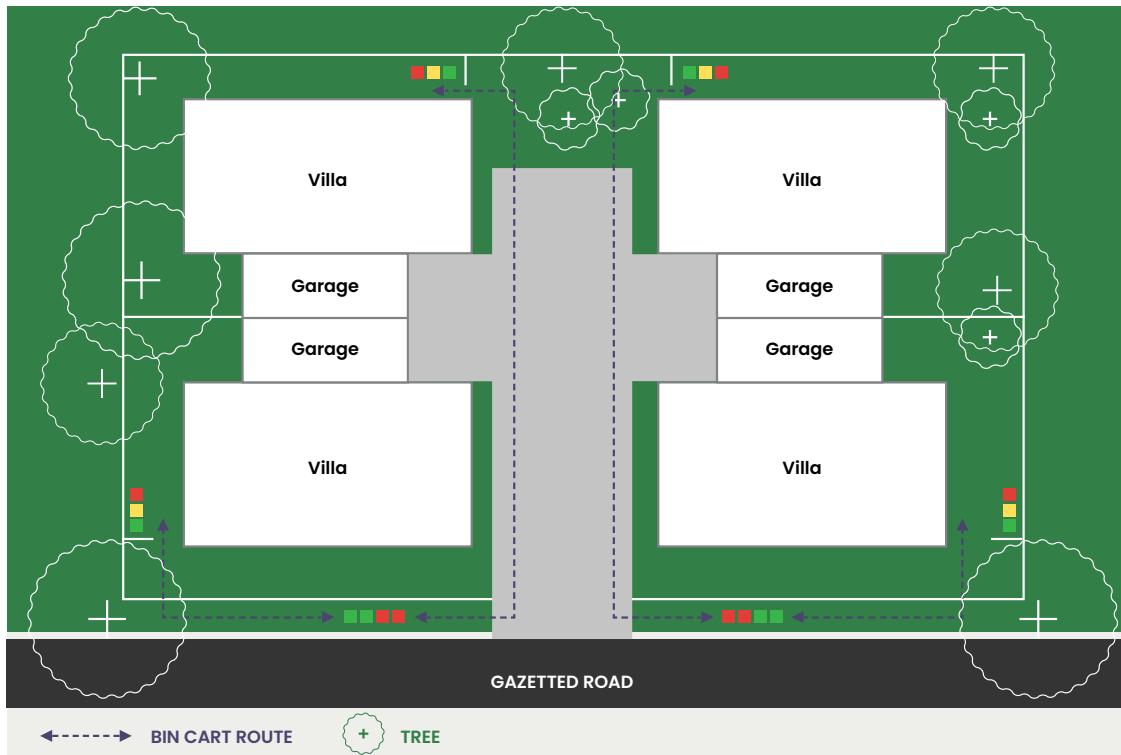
Waste storage area and kerbside waste collection point for multi-dwelling housing
